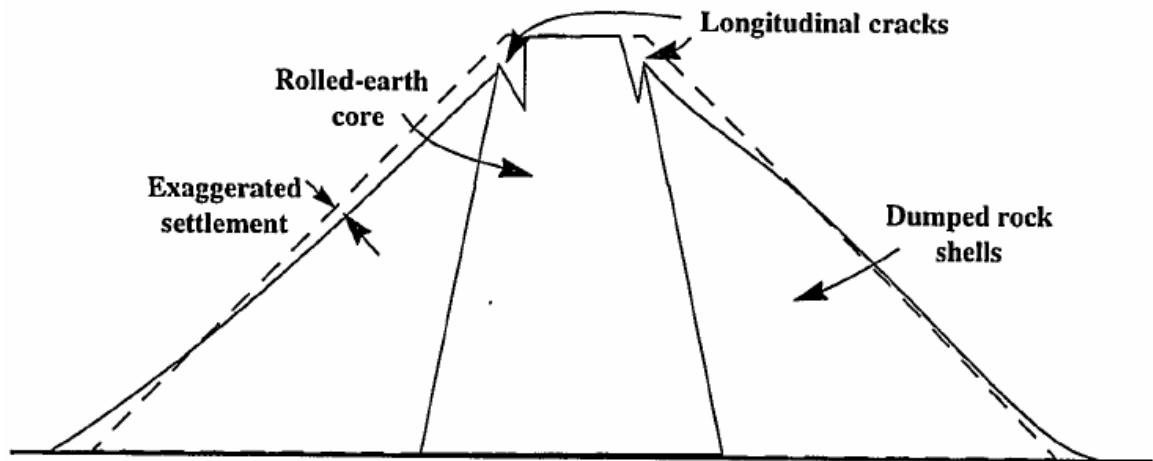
3: Failure in terms of longitudinal cracks in an earth dams [14].
